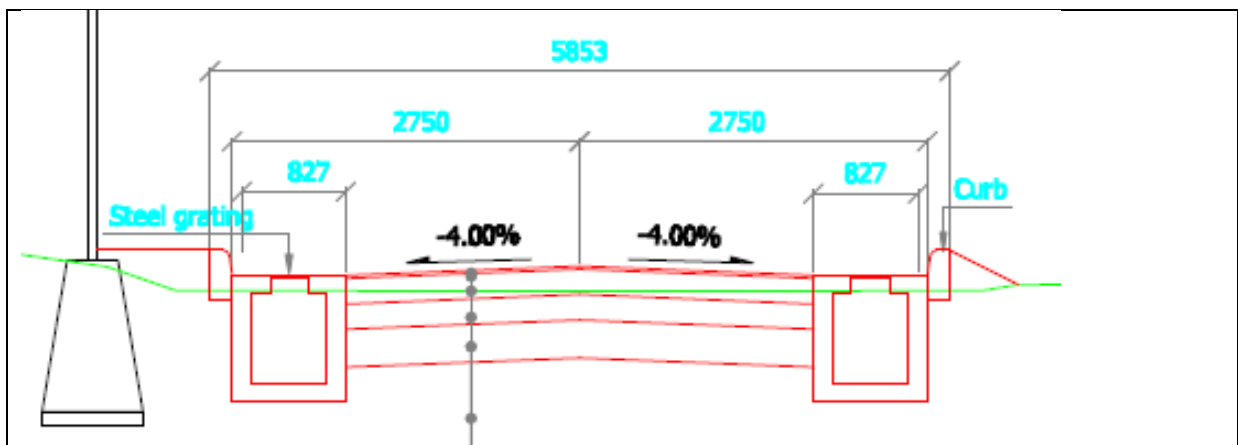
Updated design for cross-section of access road, Road 6 and Road 12
